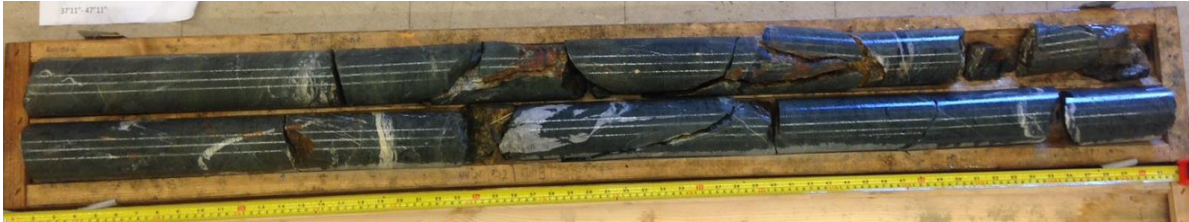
Bedrock Core Sample for BH3 from Elevation 302.1 m to 299.8 m
